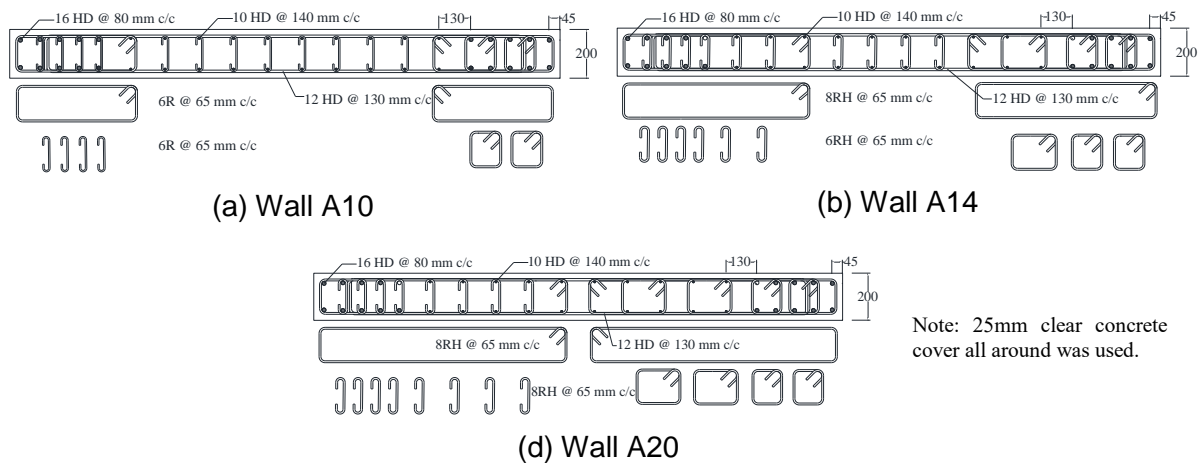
Cross-sections and reinforcement detailing of the test walls.
